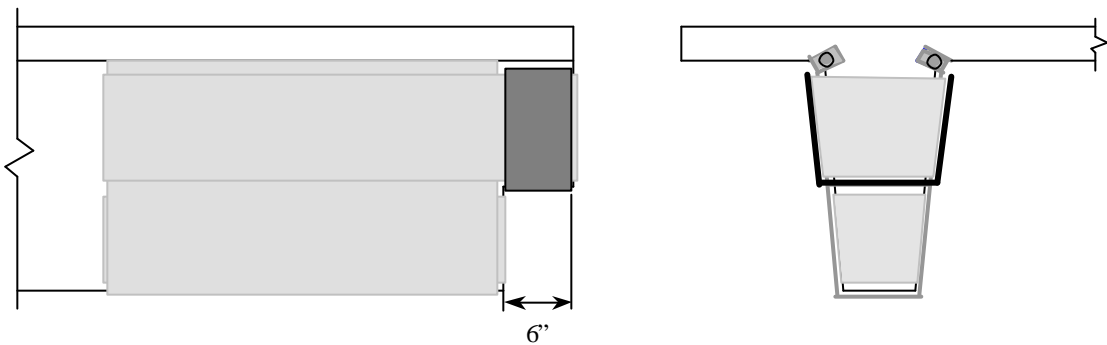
Installation Procedure of Two-Ply CFRP Reinforcement with End Anchor
